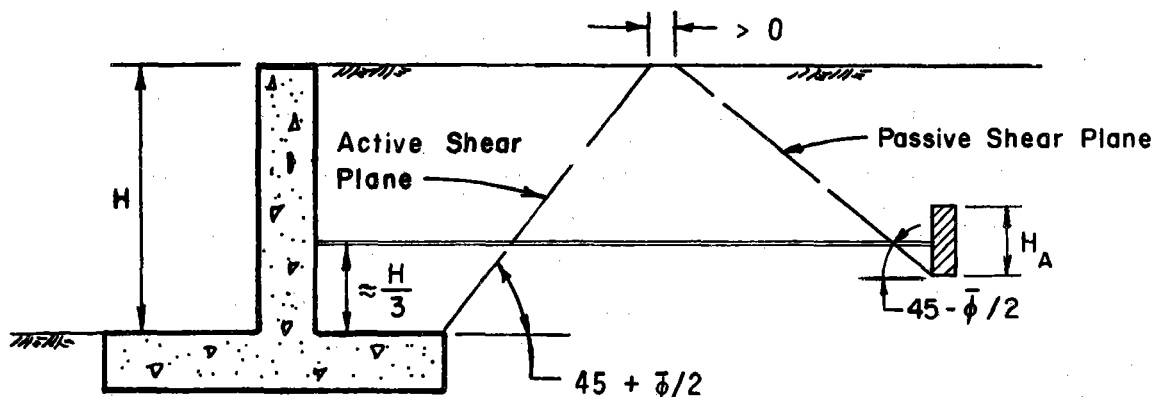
ANCHOR PLACEMENT AND RELATED SHEAR ZONES
